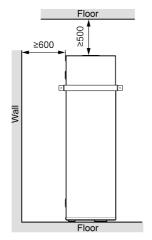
Installation diagram of the water tank (Unit: mm)
